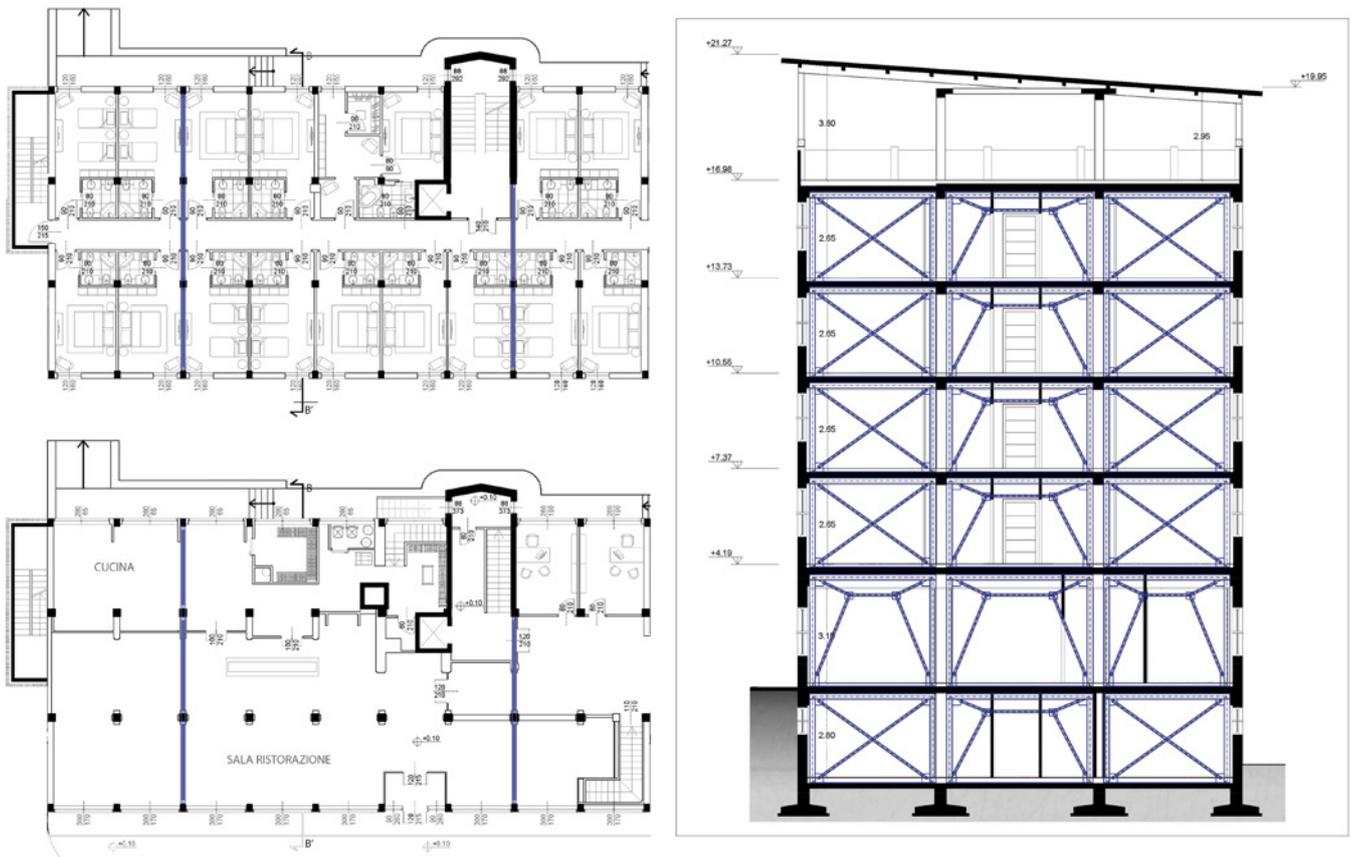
In blue, on the left: the proposed arrangement of the steel braces on the ground floor and standard floor plan; on the right: the arrangement of the steel braces in elevation.
